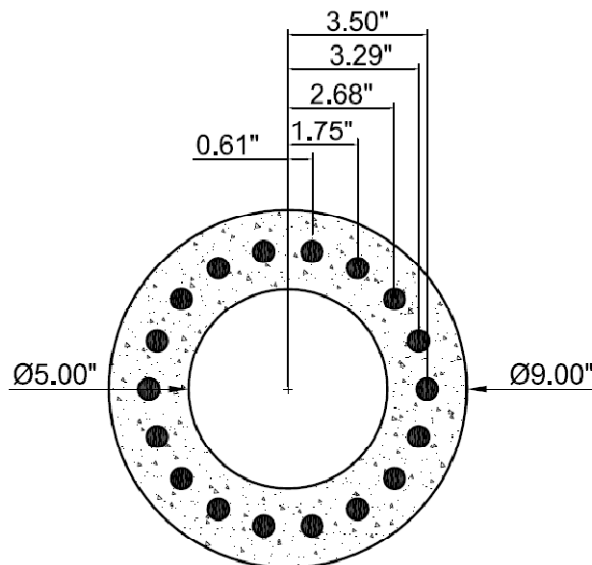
An Illustration Showing the Cross Section of the UHPC Horizontal Brace 9x2 in. (229x50.8 mm) with 18-0.6 in. (15mm) Strands
